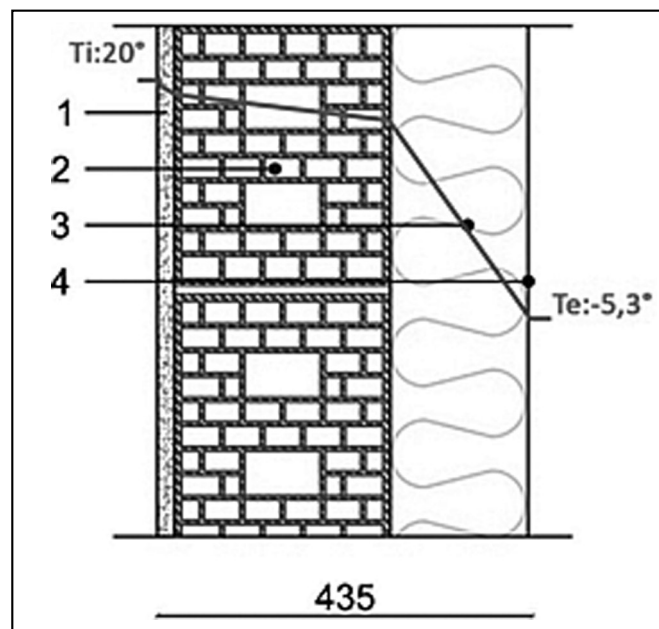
Stratigraphy of the vertical perimeter wall of the technological solution with a structural mesh in reinforced concrete and brick masonry
